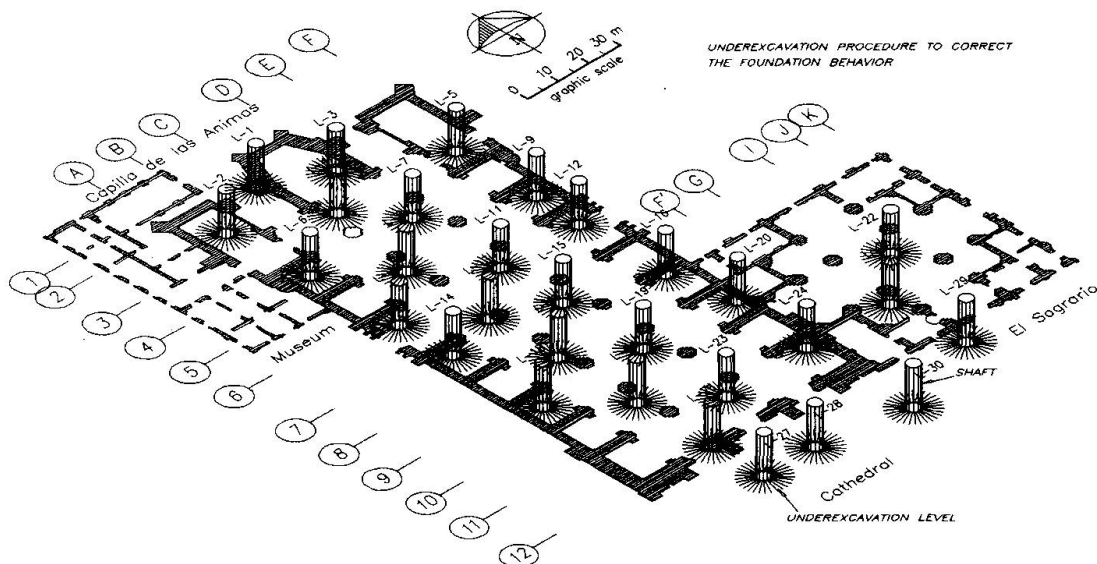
SHAFT AND RADIAL UNDEREXCAVATION BORINGS LOCATION
